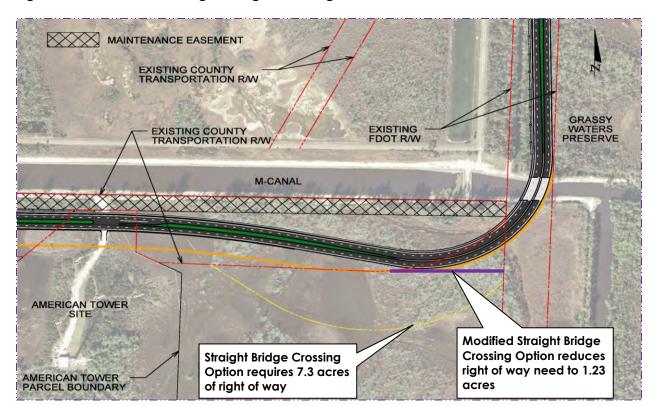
M-Canal Straight Bridge Crossing - Modified
